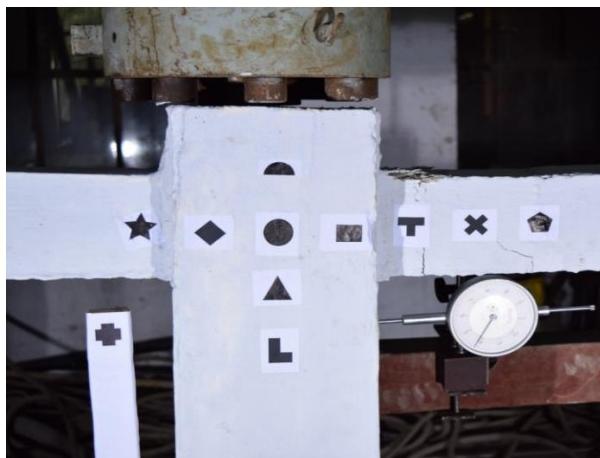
Crack in The Front of Left Beam Column Joint
